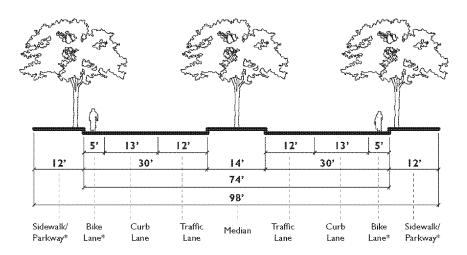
(2 of 3): CITY OF CHINO GENERAL PLAN ROADWAY CROSS-SECTIONS
